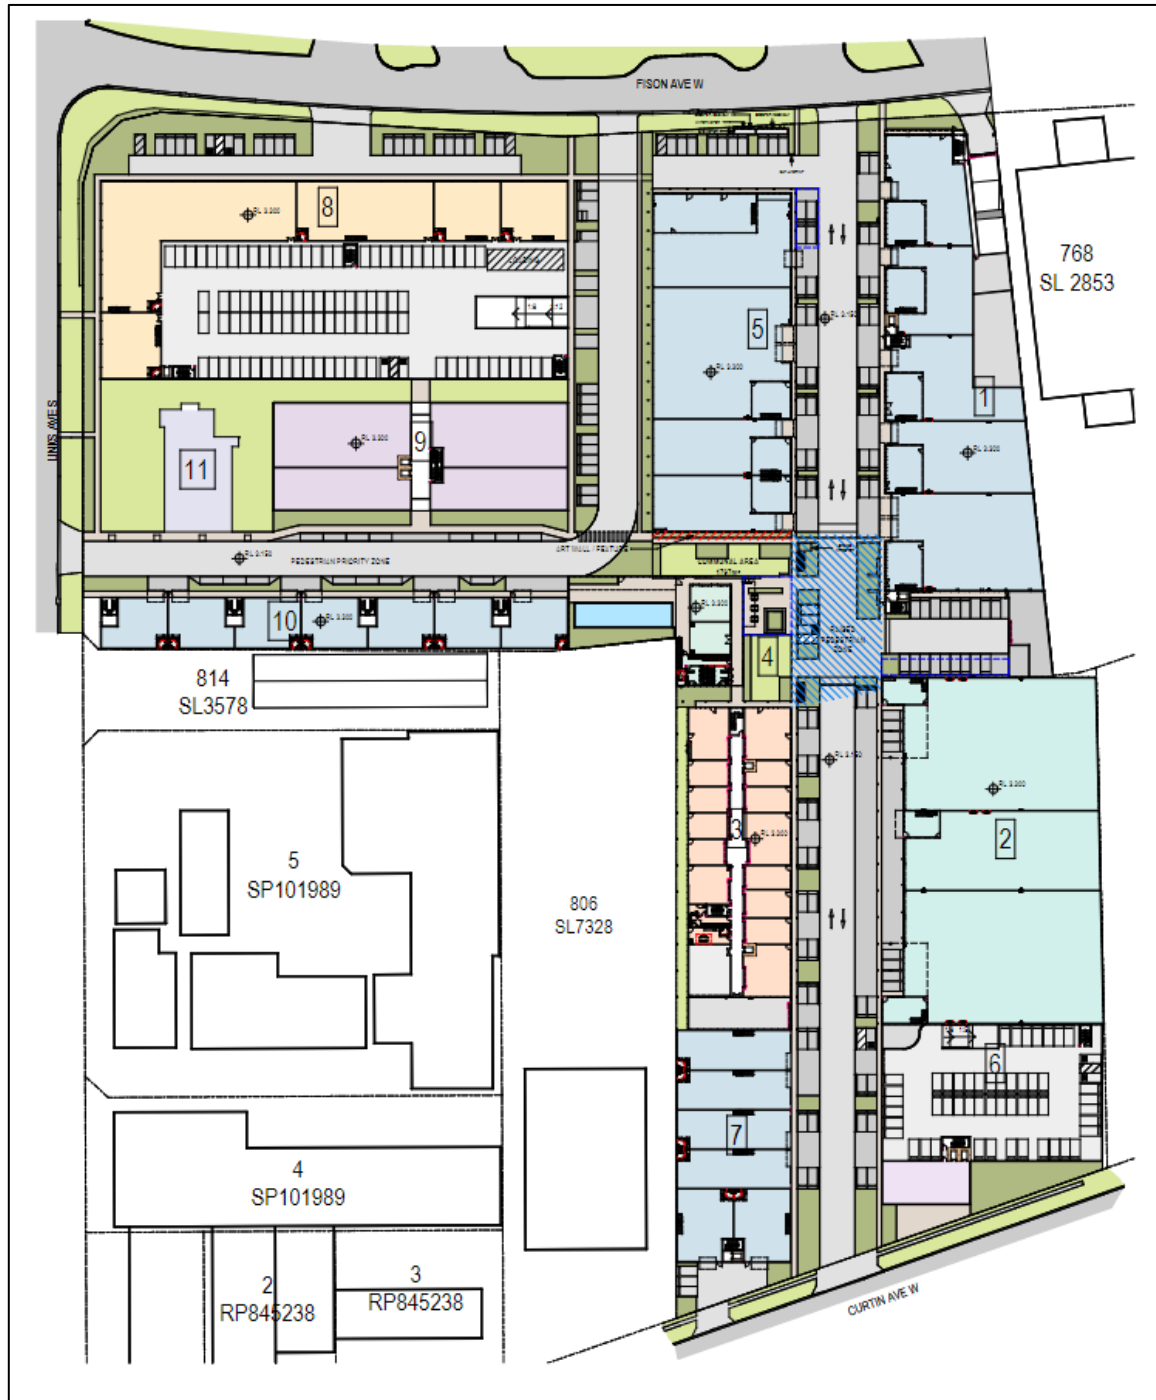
Proposed Development Site Plan - Ground (Rothe Lowman Property Pty. Ltd., drawing no. TP00.50 P4, 2021)
